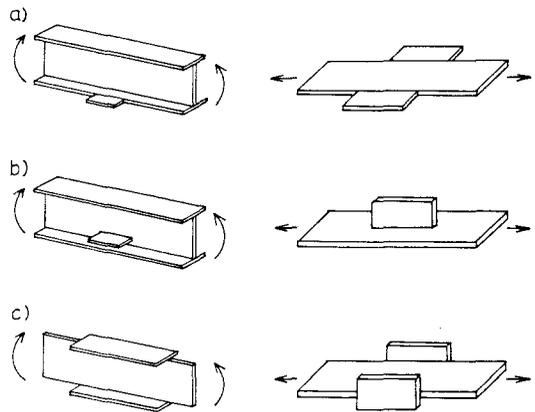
Gussets Welded to (a)Tension Flange, (b) Web, and (c) Tension Plate Perpendicular to the Plate.
